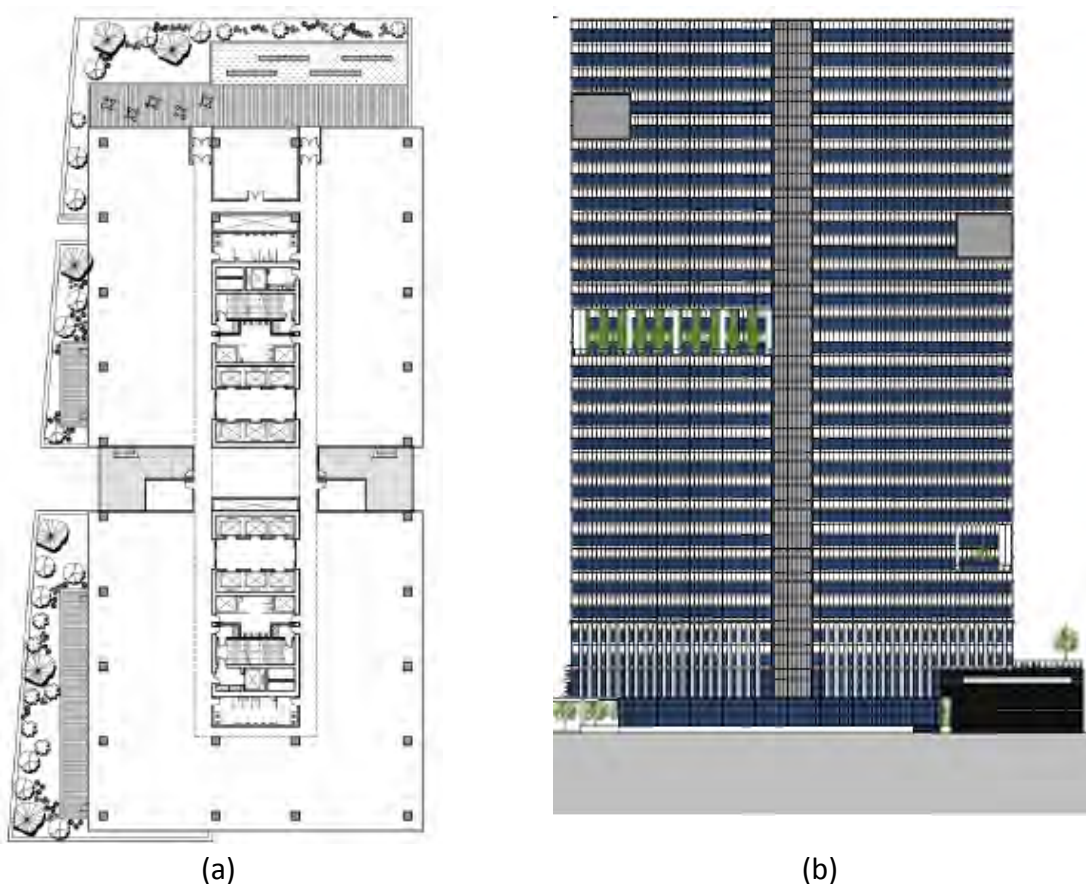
(a) Floor plan and (b) Elevation of originally proposed 30 storied dual tower building with 4 basements for RAJUK-URU
